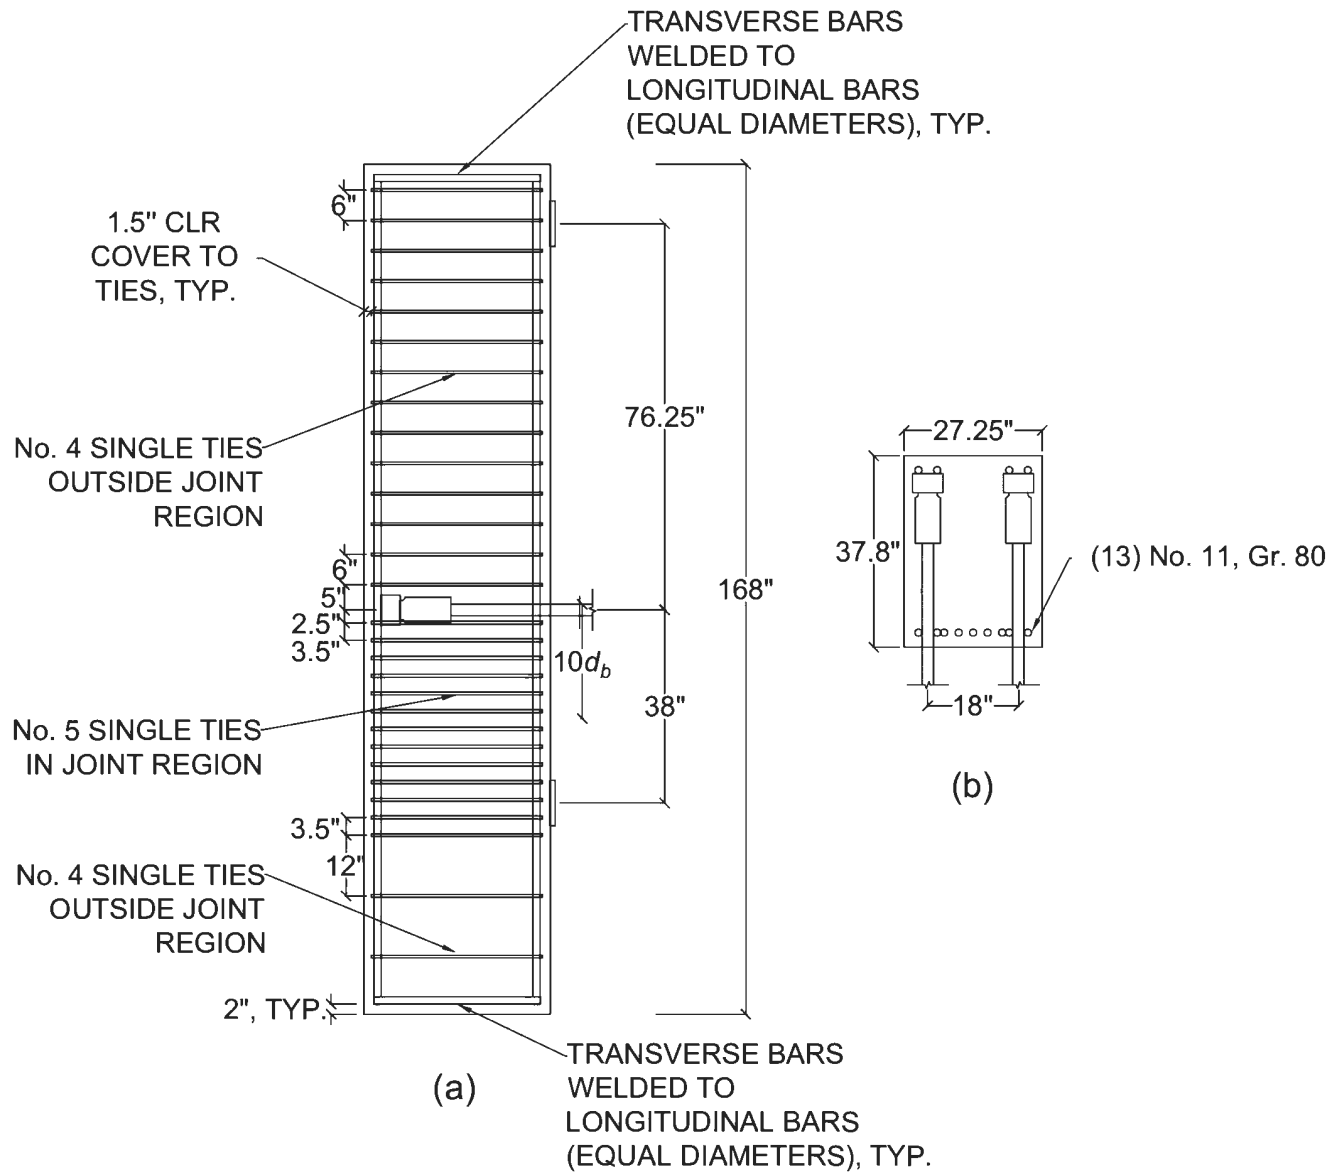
Details of reinforcement layout for No. 18 headed bar specimen 18-4: (a) elevation, (b) cross-section
